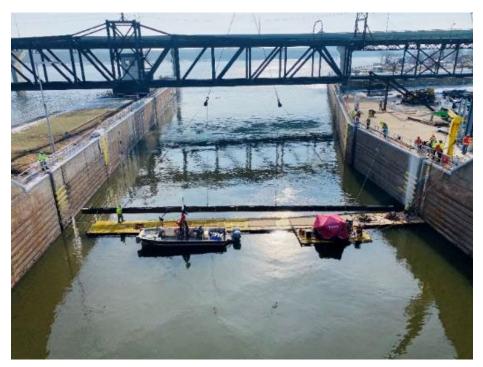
Soundbar Installation – Lock No. 19 (Keokuk, Iowa)
